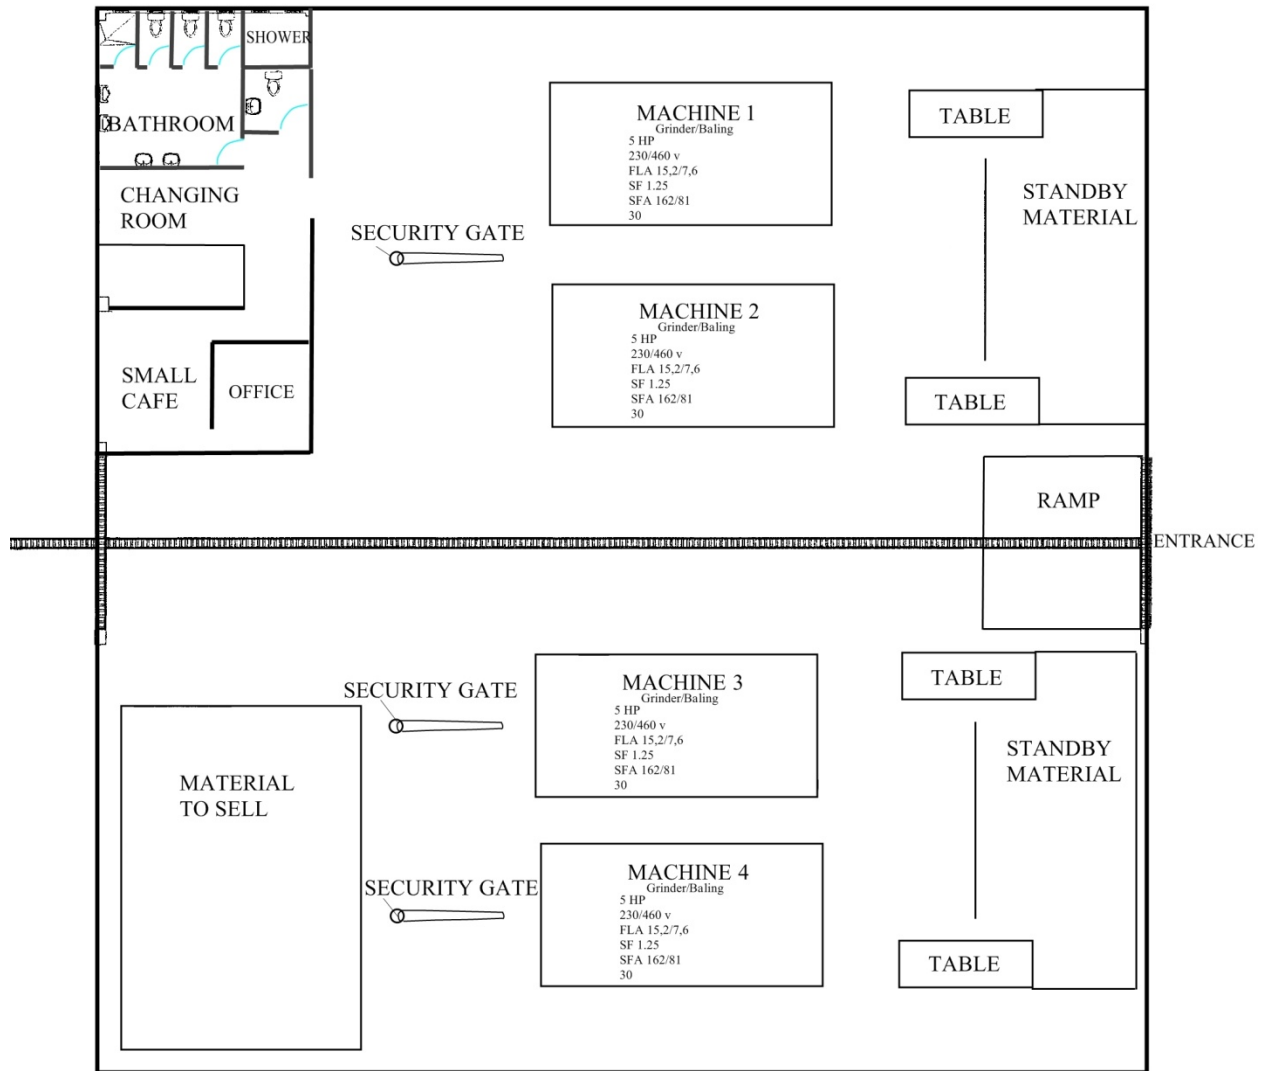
Floor Plan of Recycling Plant in Pavas (Mata, 2008)
